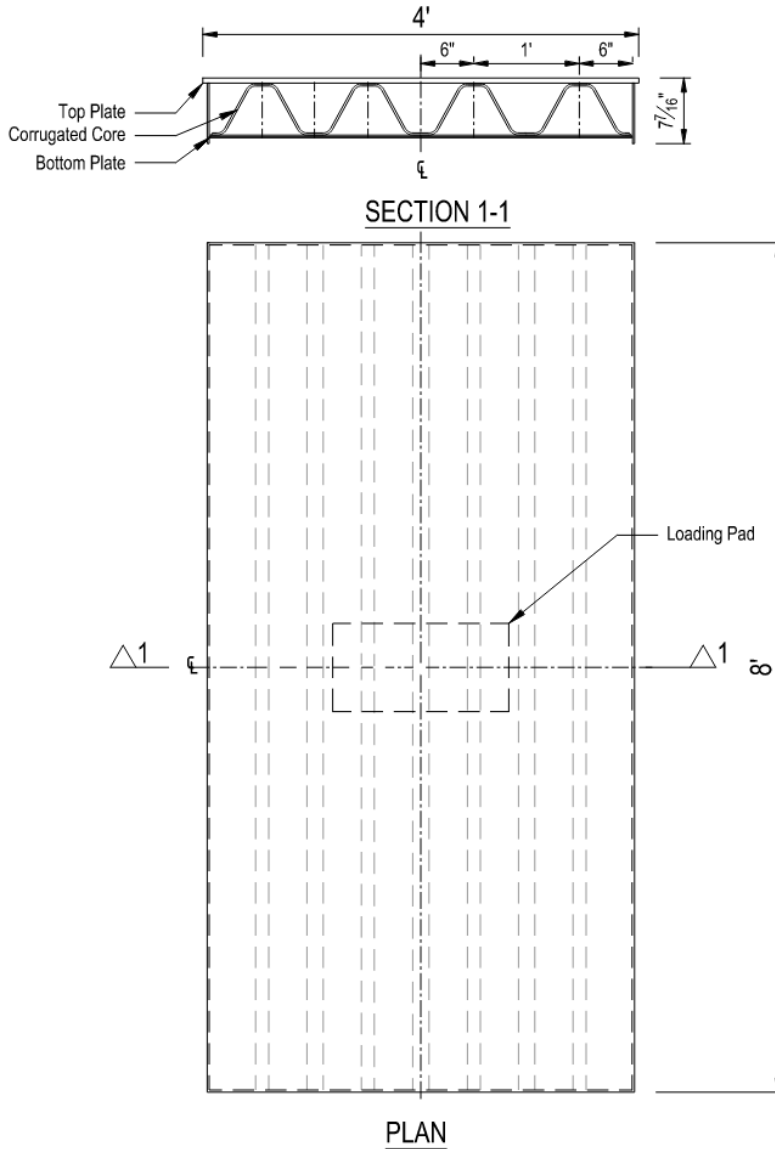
Plan and cross-sectional views of the bridge deck specimen. (1inch =2.54 cm)
